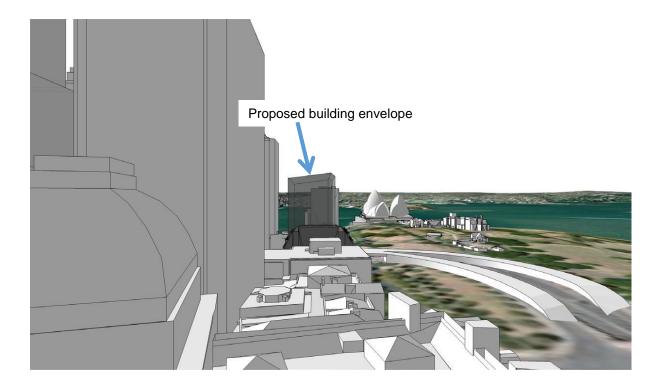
Proposed building envelope as viewed facing north from a typical mid-rise apartment from The Astor
